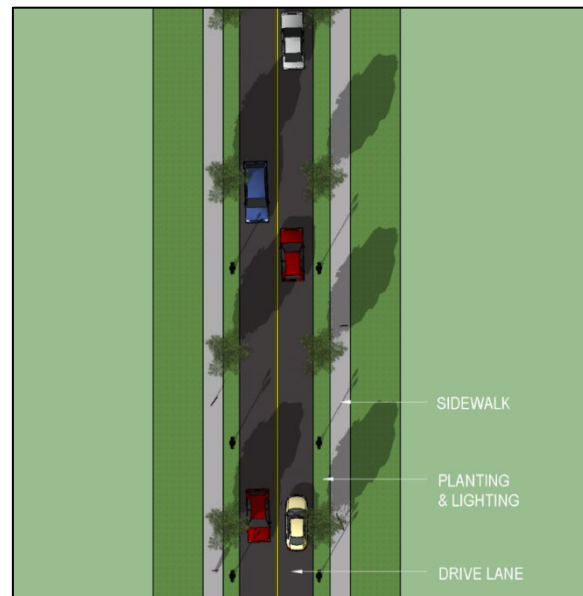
Tertiary Road Streetscape Standards Cross-section
